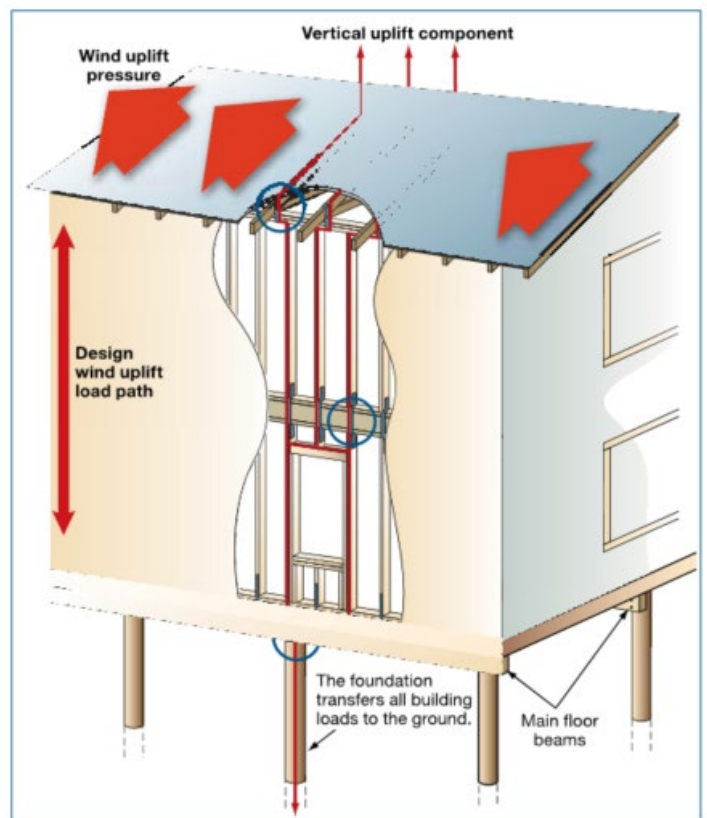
Image showing load path continuity from roof to foundation. [FEMA P-804 Page 3-5]
